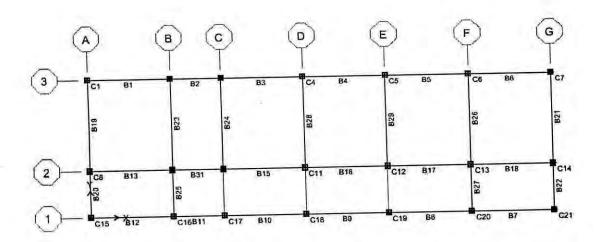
Plan of an LGED-2 type cyclone shelter
